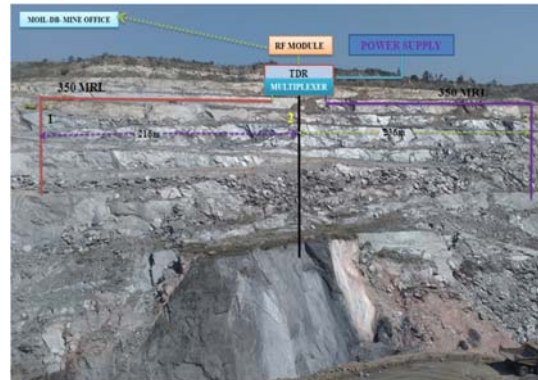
Proposed site of installation of TDR system in a typical opencast mine.
